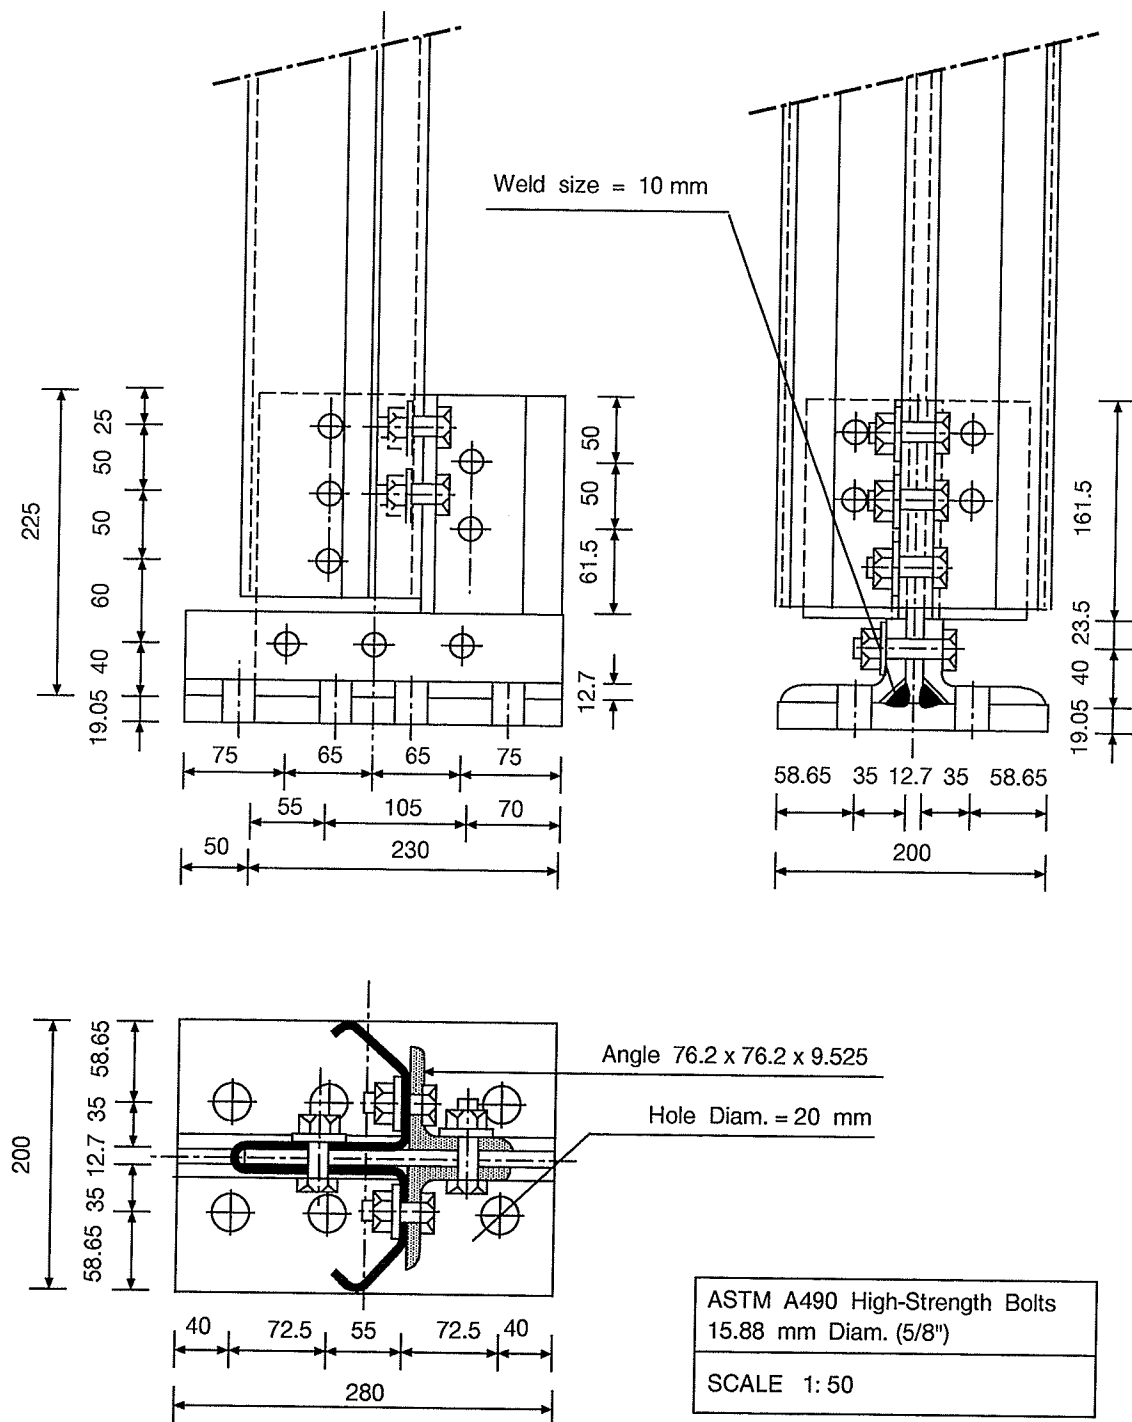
Connection Type "E" Used with Test Setup # 1.
